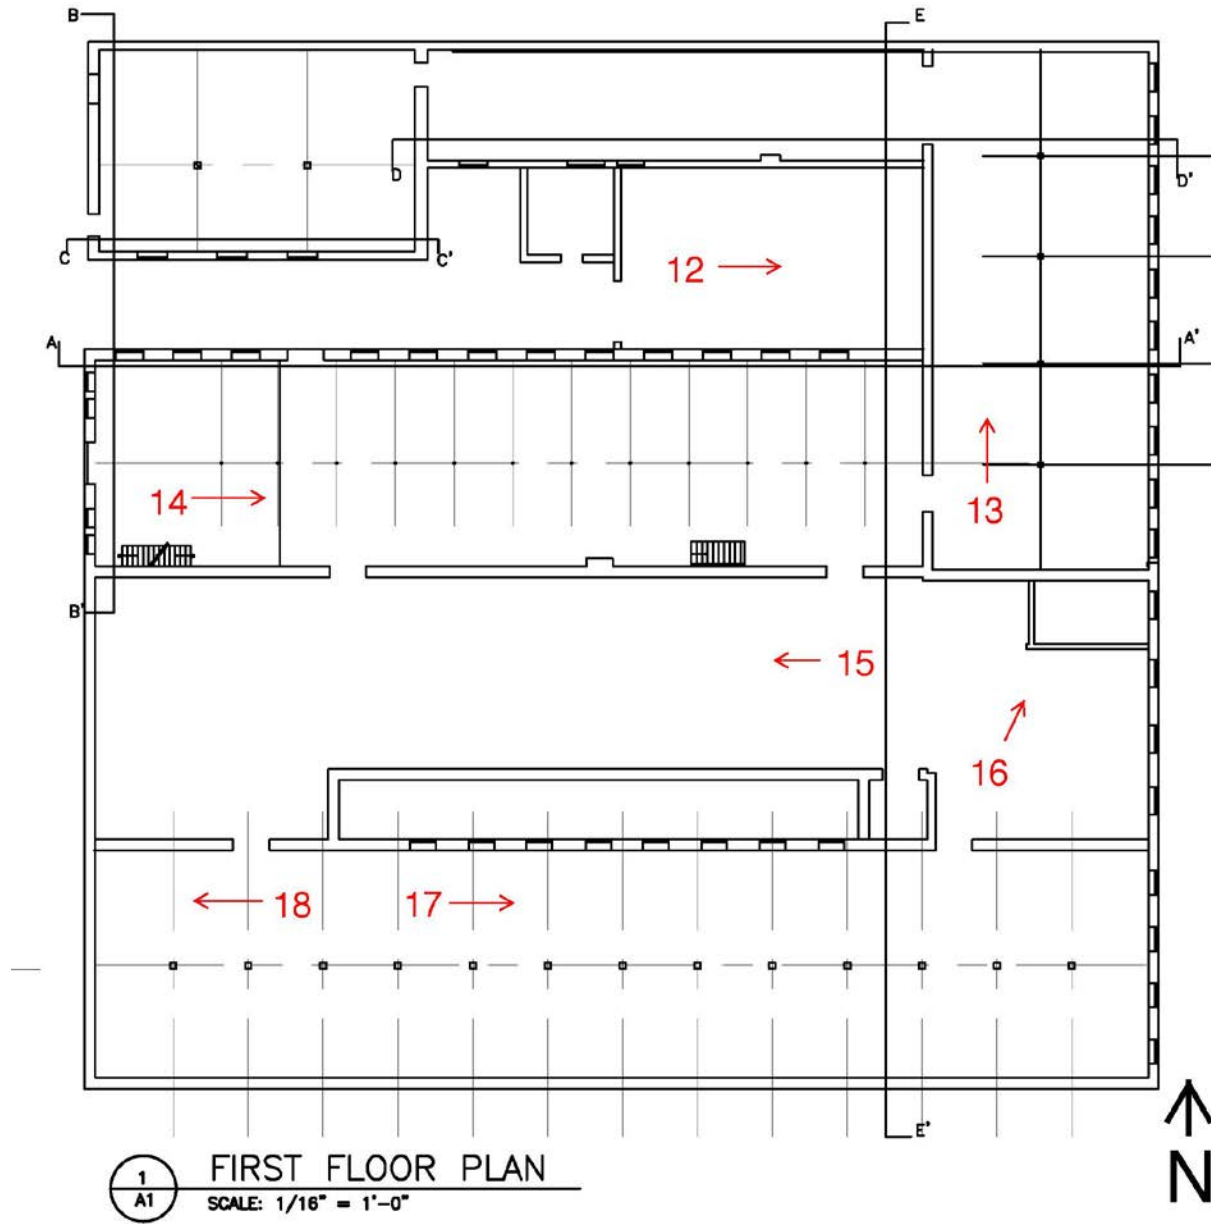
First Floor Plan, Interior Photo Key 12-18.
